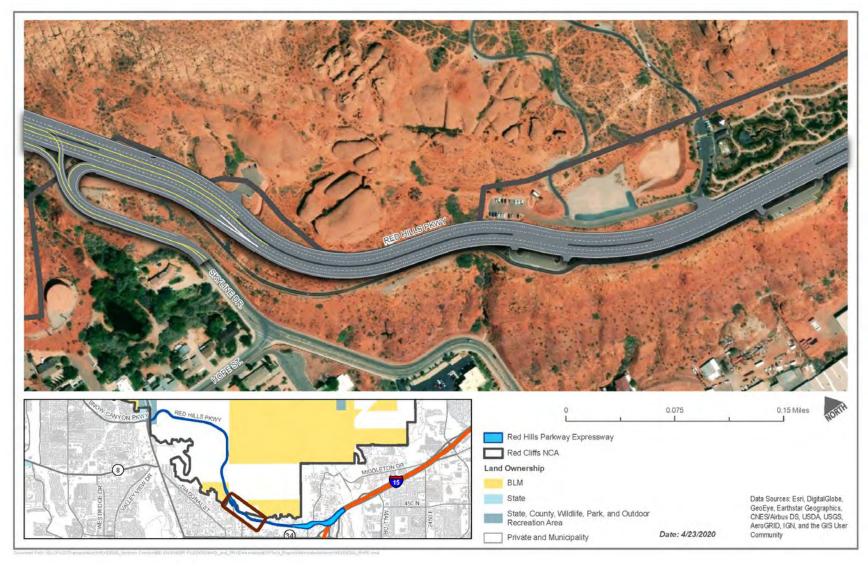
Red Hills Parkway Expressway Plan View (5 of 7)
